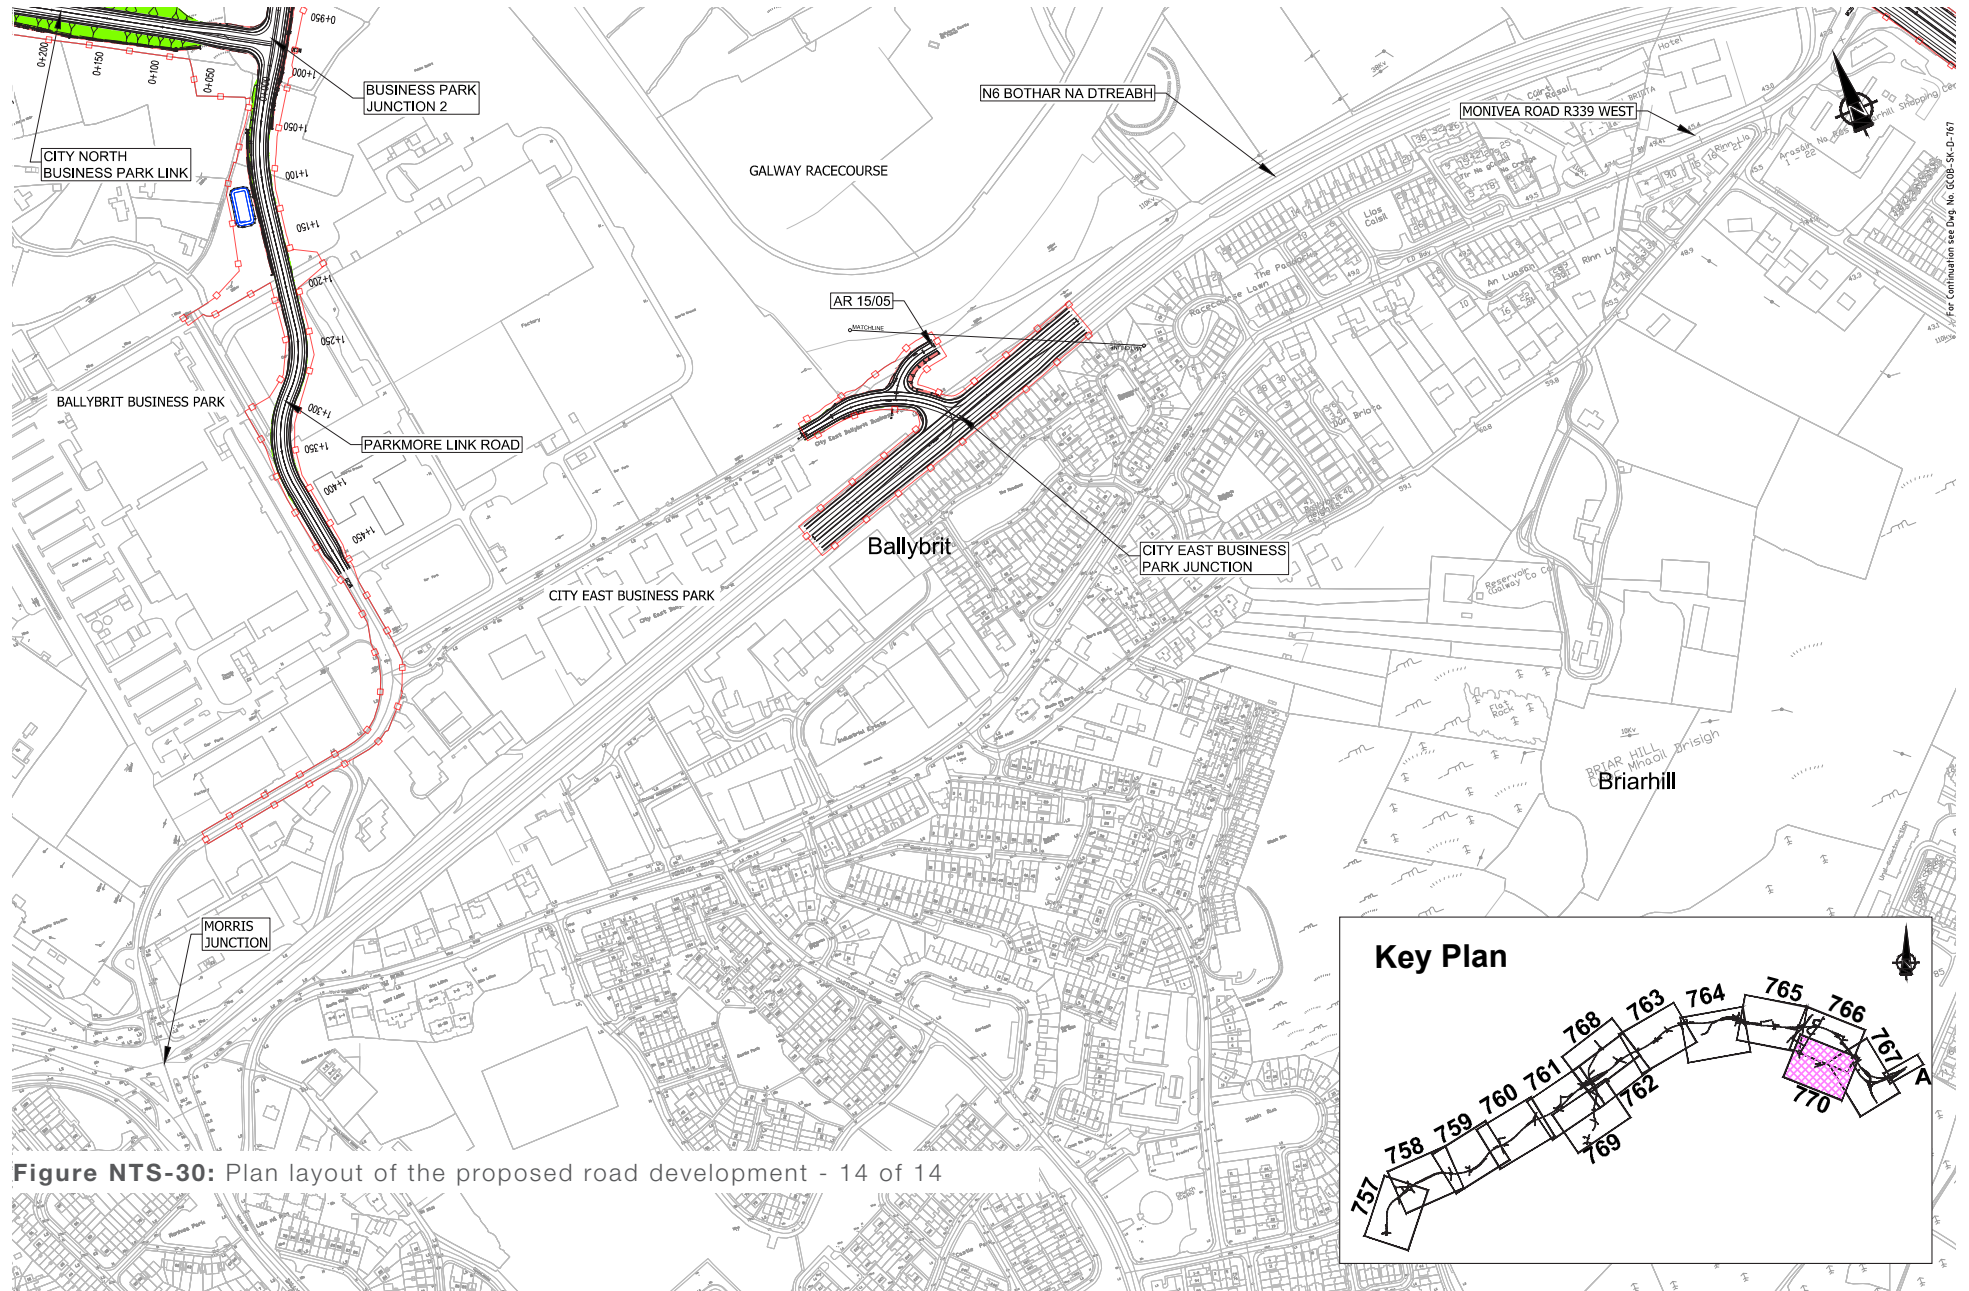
Plan layout of the proposed road development - 14 of 14
